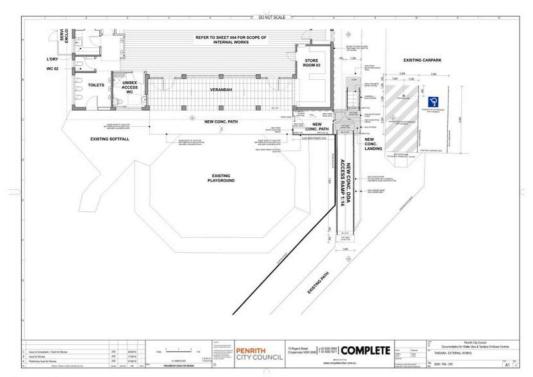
Proposed Detail Plan (Exterior Works) Source: Complete Urban Pty Ltd
